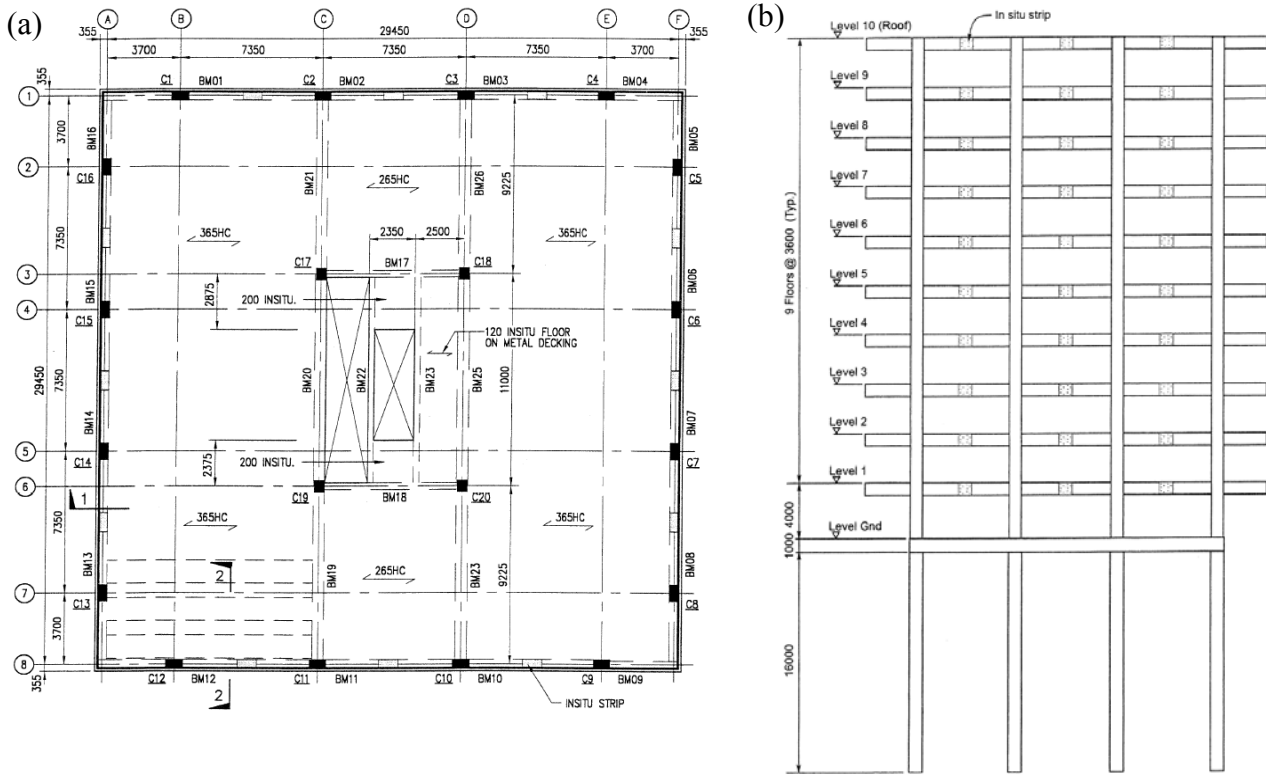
(a) Plan; and (b) elevation of the Red Book building [2].
